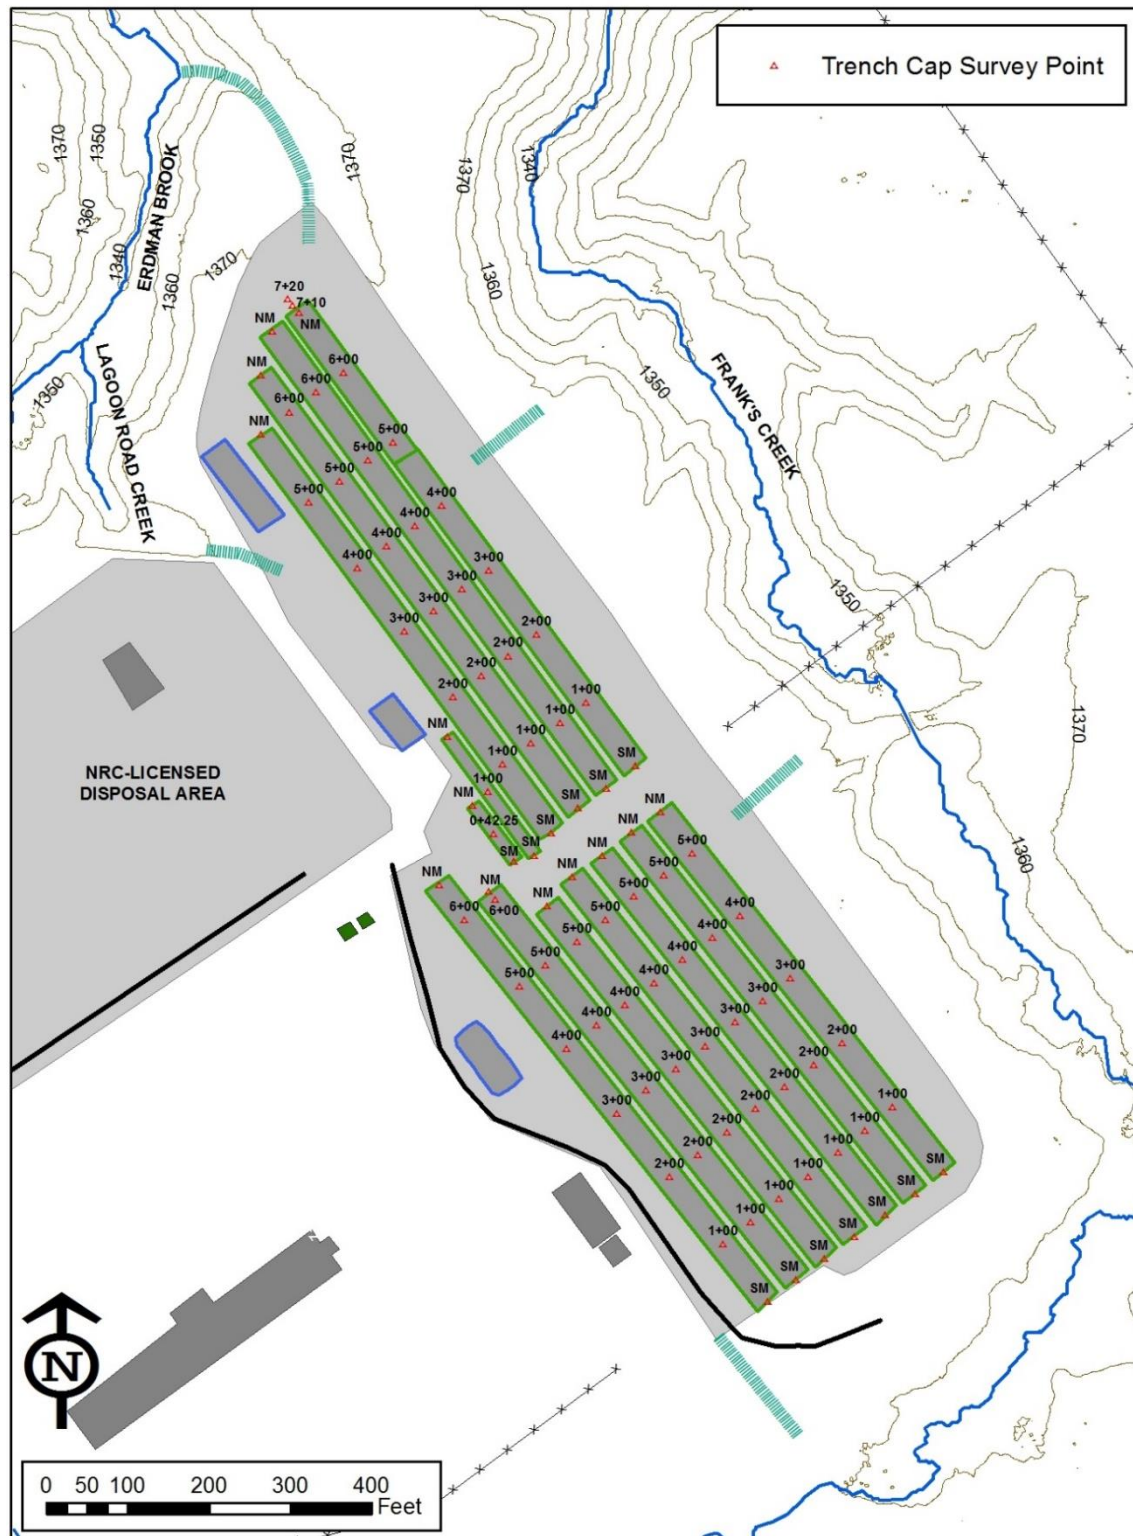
Trench Cap Ground Surface Elevation Survey Points
